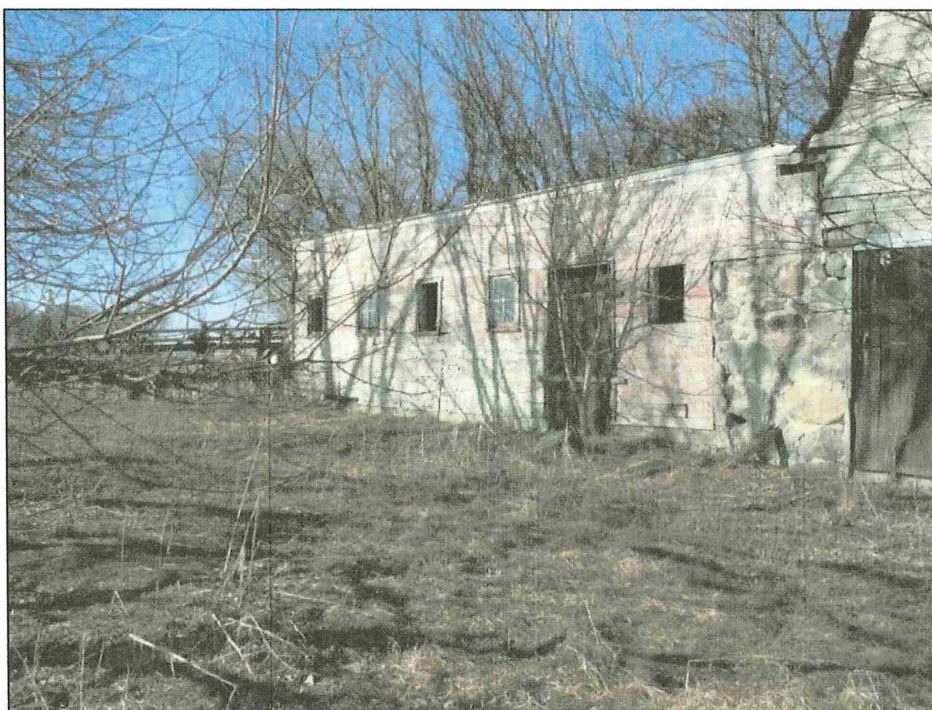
699 45TH STREET NW, WEST WING OF BARN, LOOKING NW
